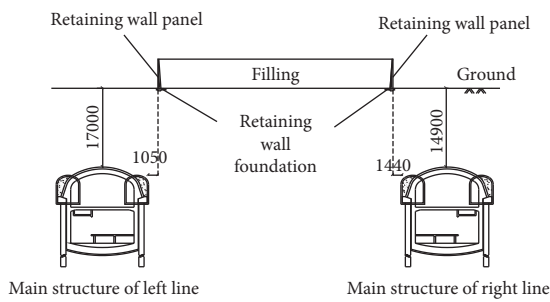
Vertical positions of the main structure of the station and the retaining wall (unit: mm).
